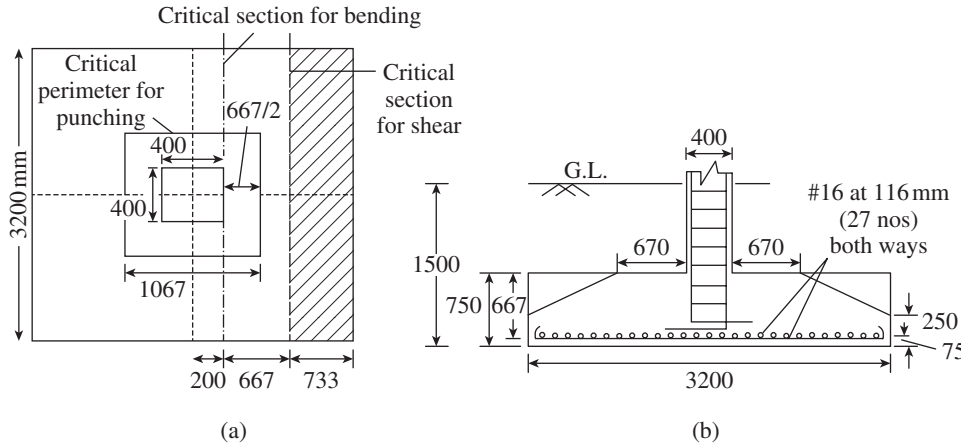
Details of square footing of Example 15.2 (a) Plan (b) Section
